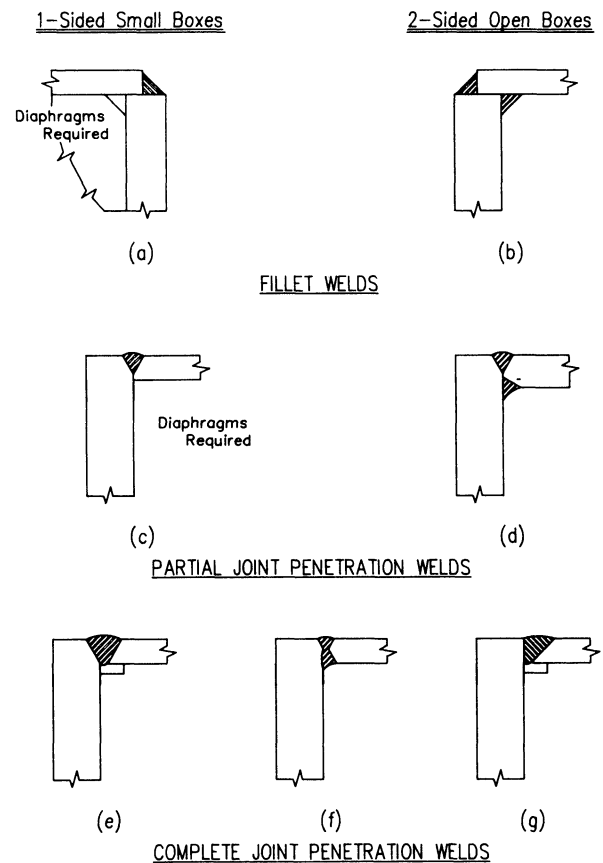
Longitudinal weld design choices—corner welds.
